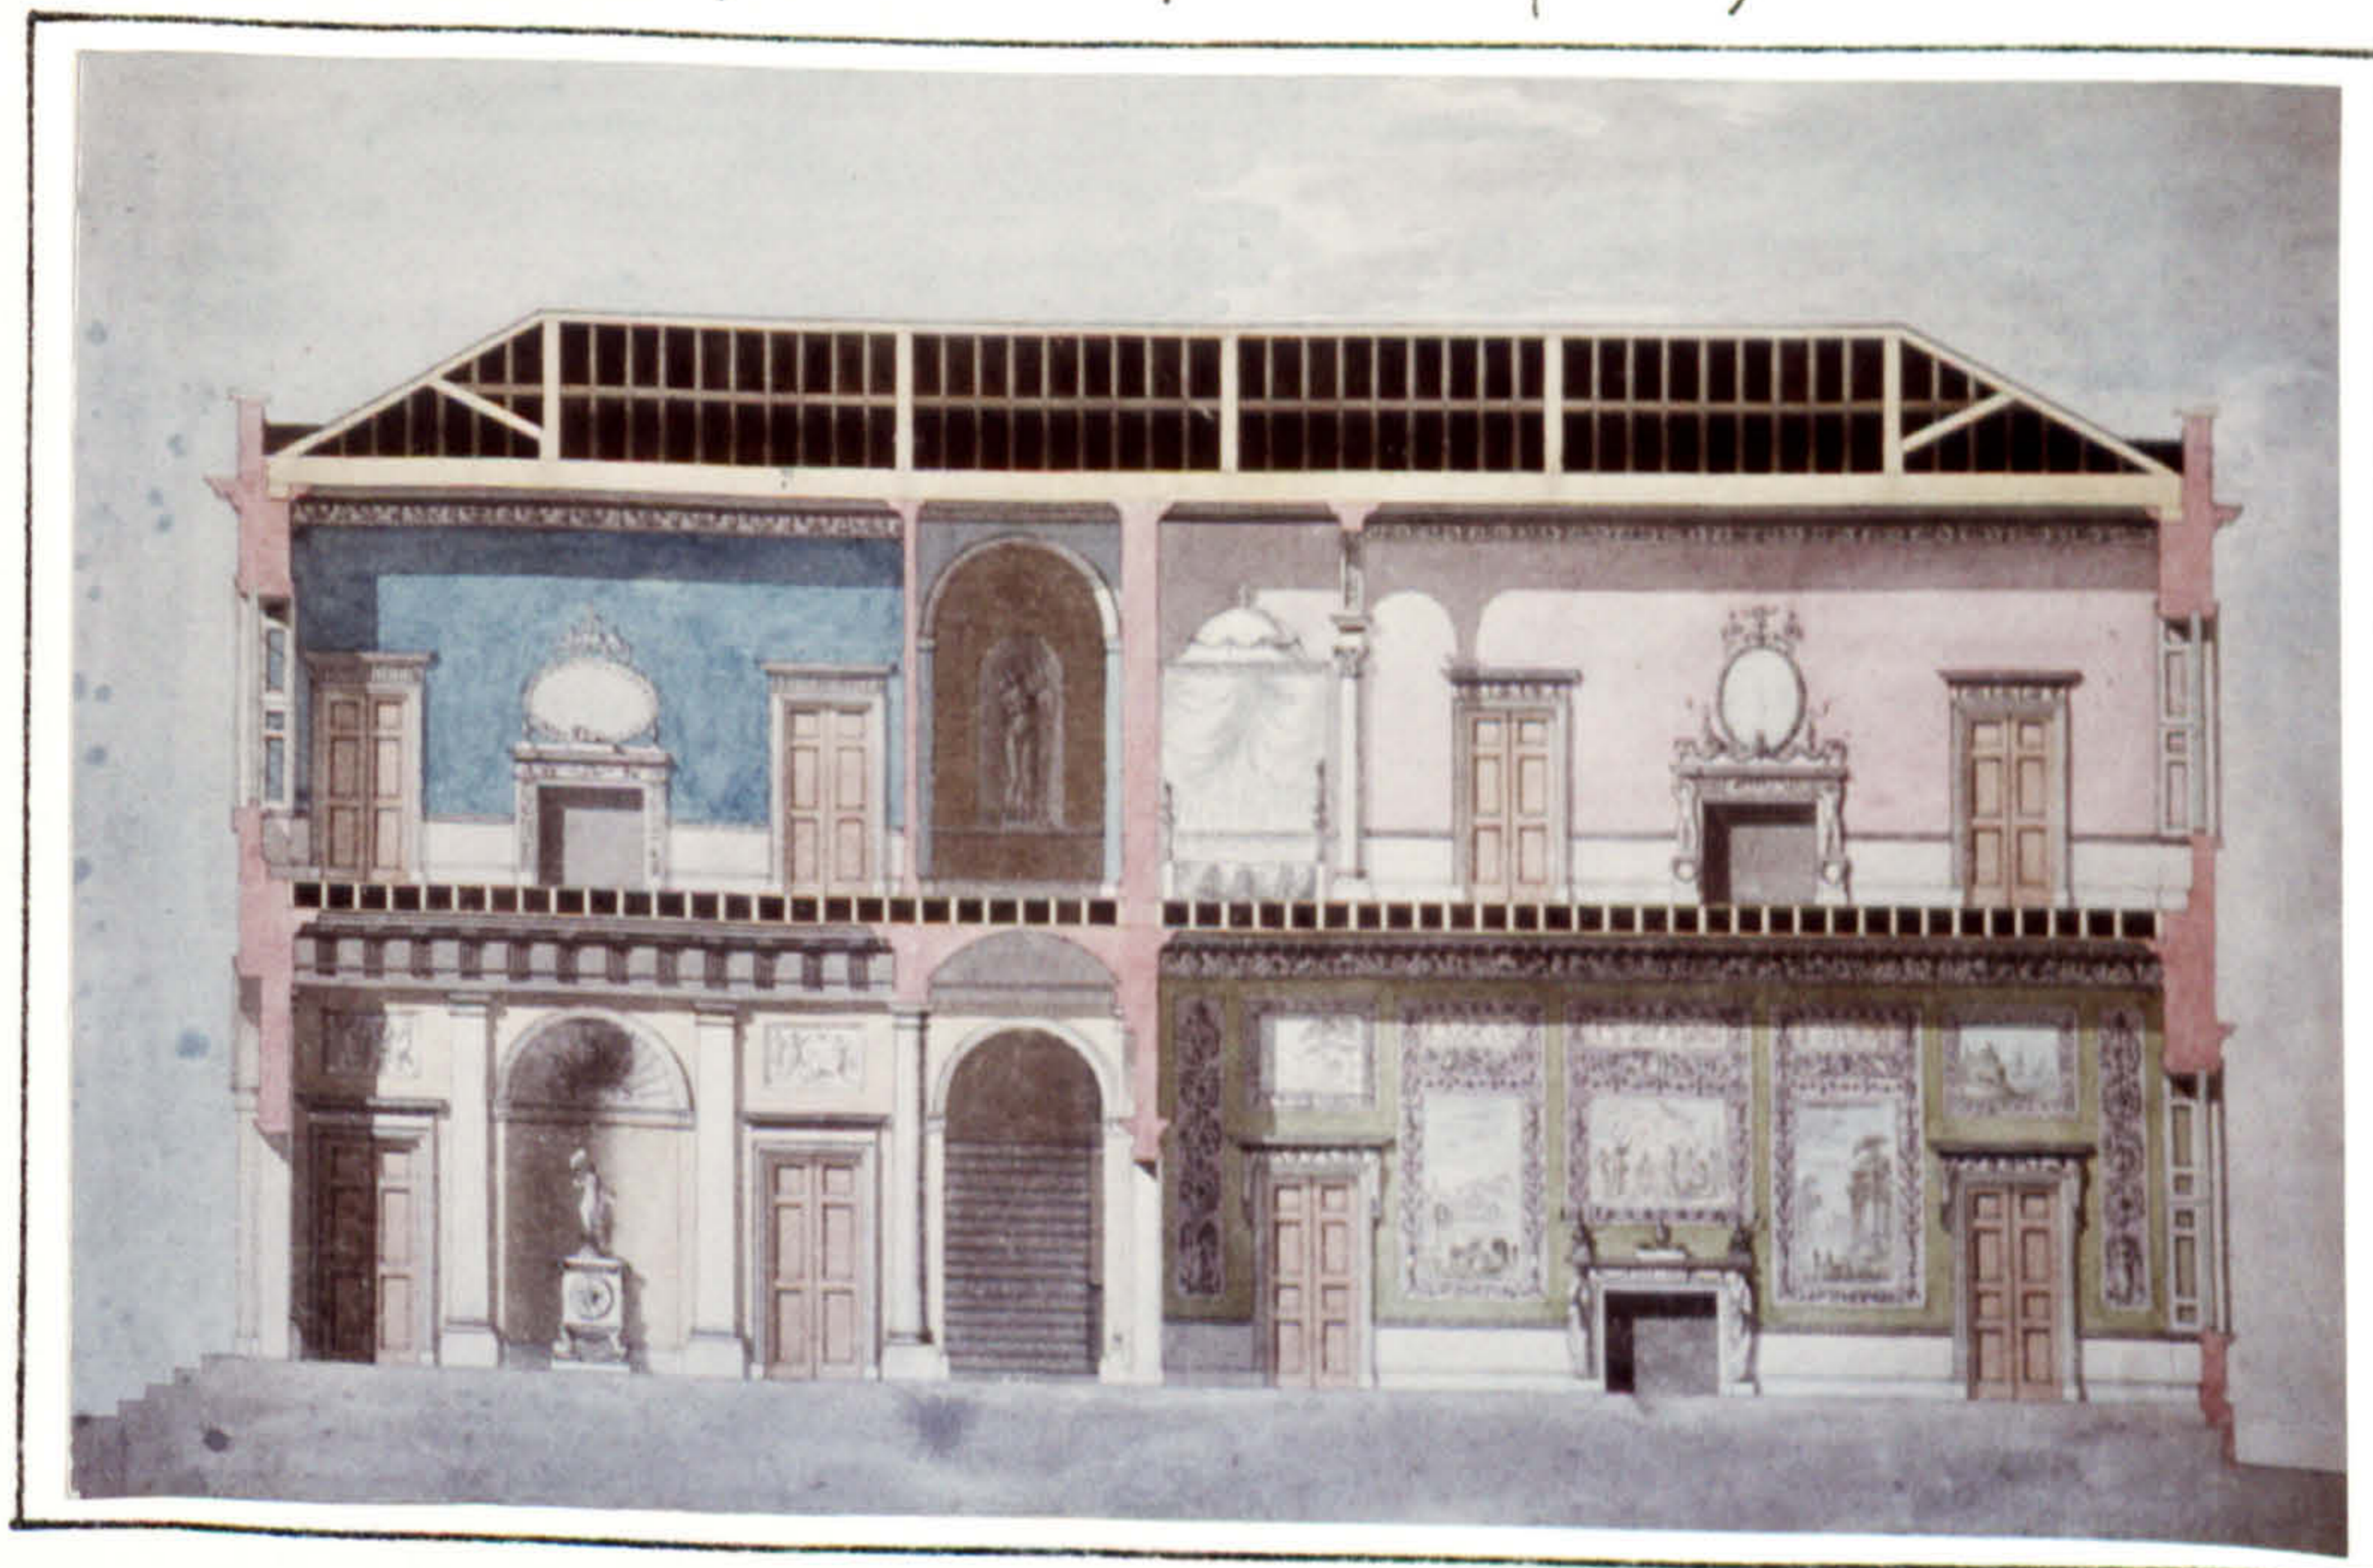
EDWARD STEVENS (ATTRIBUTED TO) · SECTIONAL ELEVATION
